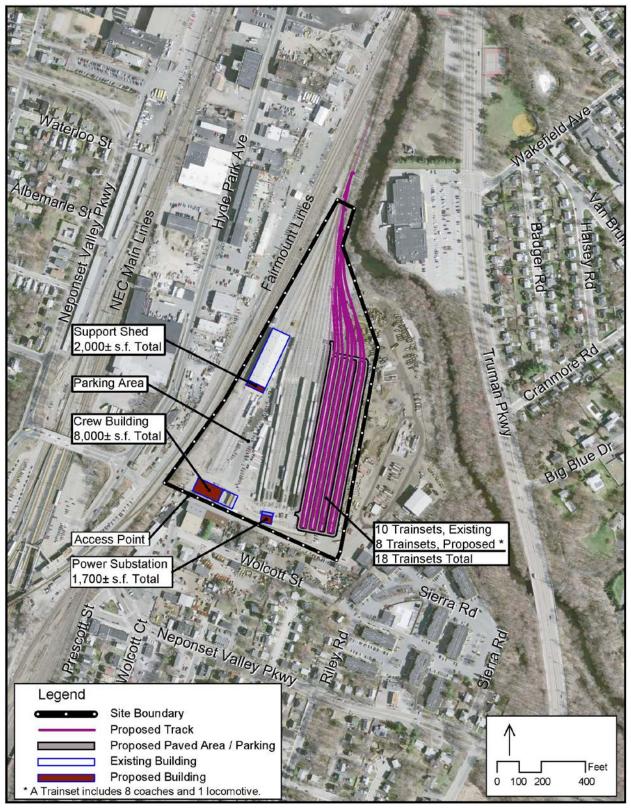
Readville-Yard 2 Layover Facility Site Plan
